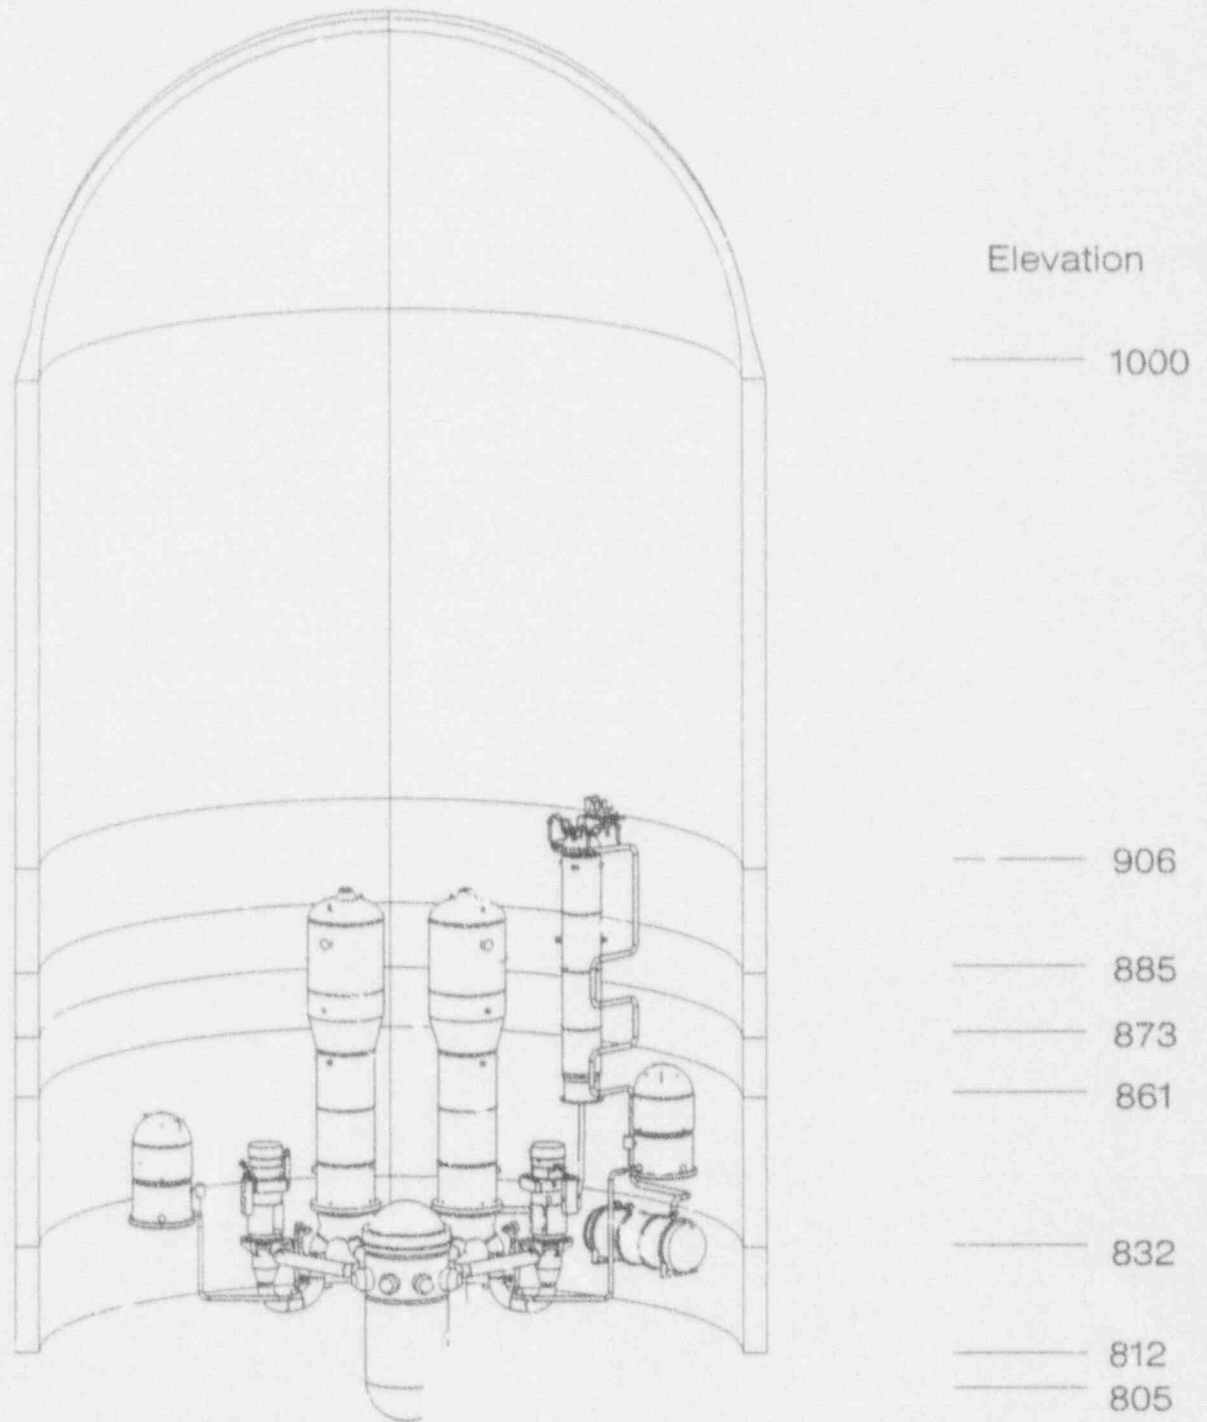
Containment Layout - Floors and Cranes
